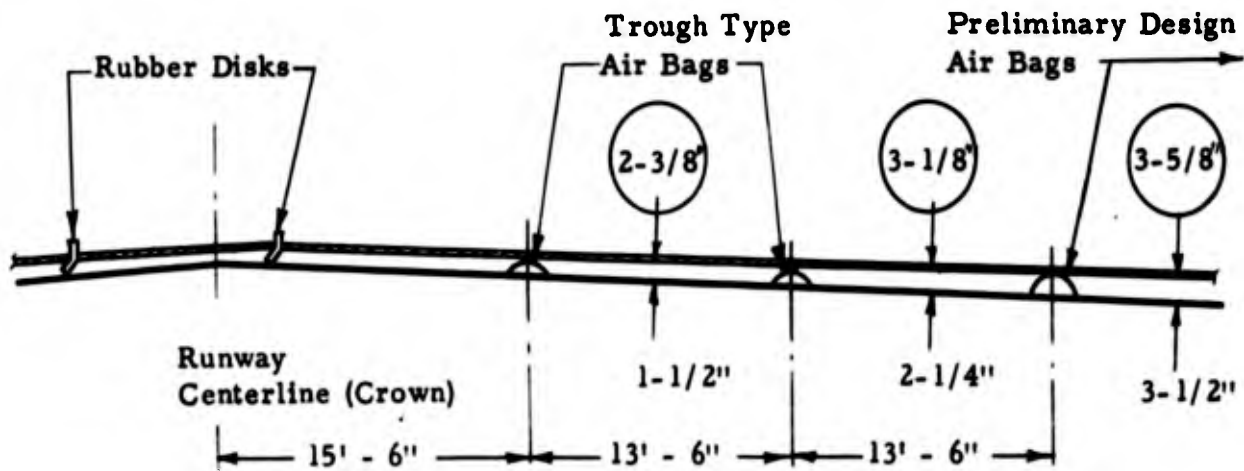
CABLE HEIGHTS FOR PRELIMINARY AND TROUGH TYPE AIR BAGS
